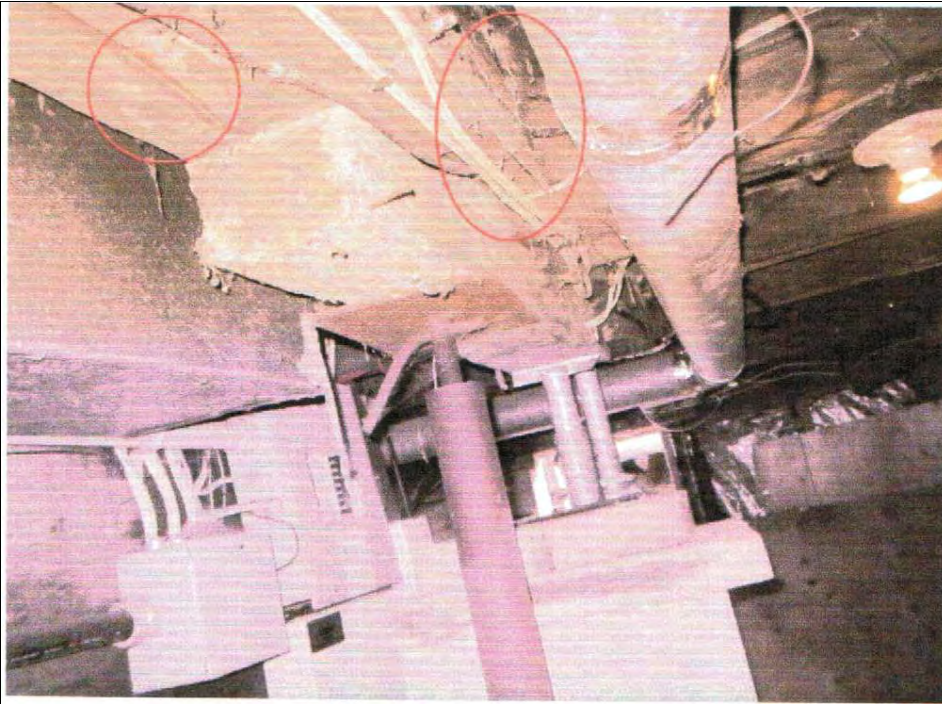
water damage, cracking to beam above, additional post supports
